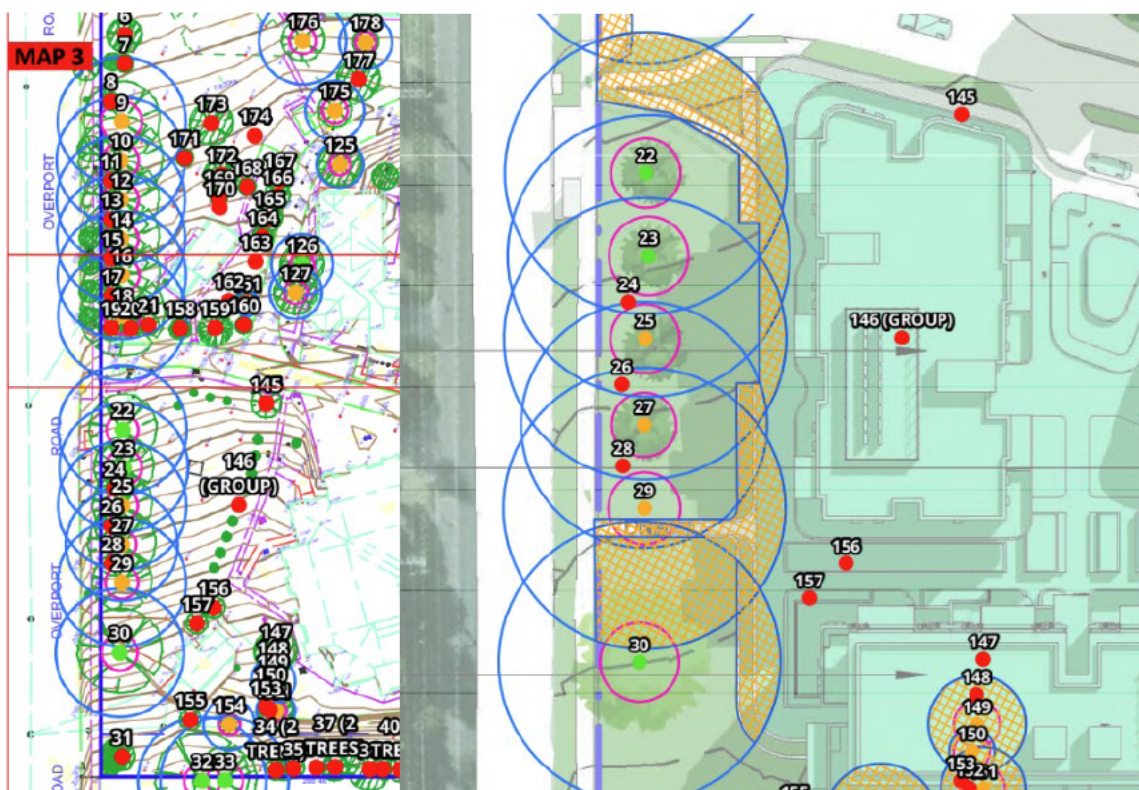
Excerpt from tree survey plan (left) showing the location of the ESO4 trees in the Overport Road frontage and excerpt from the development impact plan of the extent of built form encroachment on the ESO4 trees to be retained (Source: Arborist Report, prepared by Arbor Survey)
